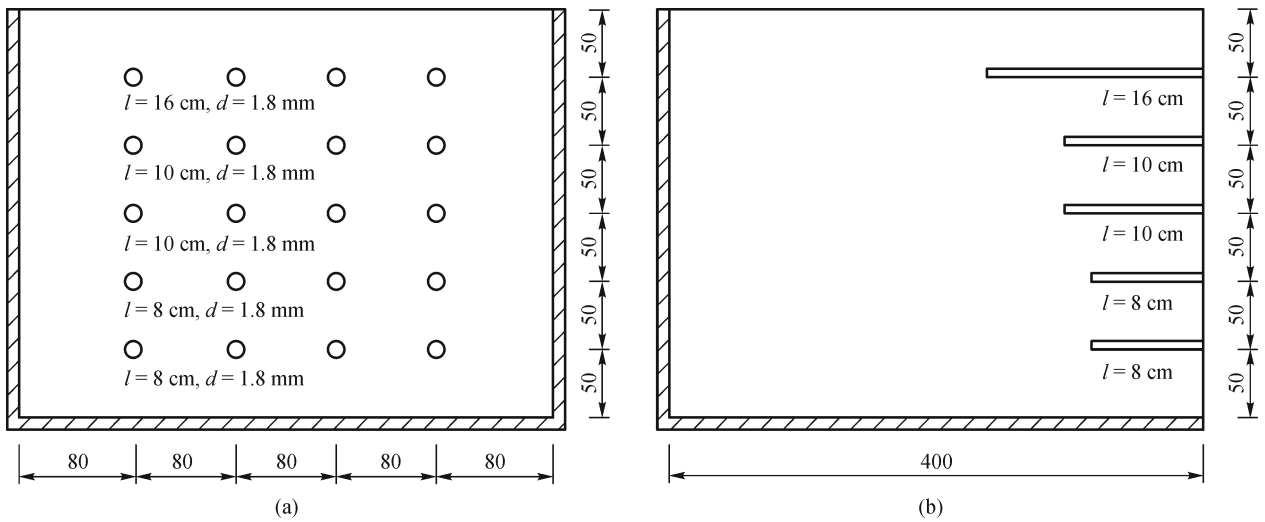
Arrangement of bolt. (a) Elevation view of bolt arrangement; (b) profile of bolt arrangement (case 3, unit: mm)
